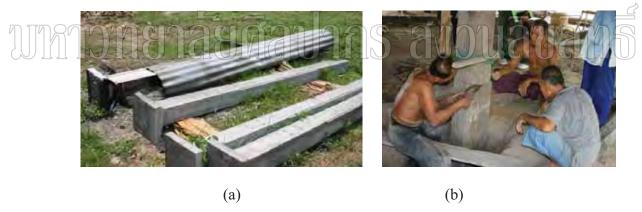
Ground level columns: (a) Precast concrete columns; and (b) Local builders repairing a decaying timber column.
